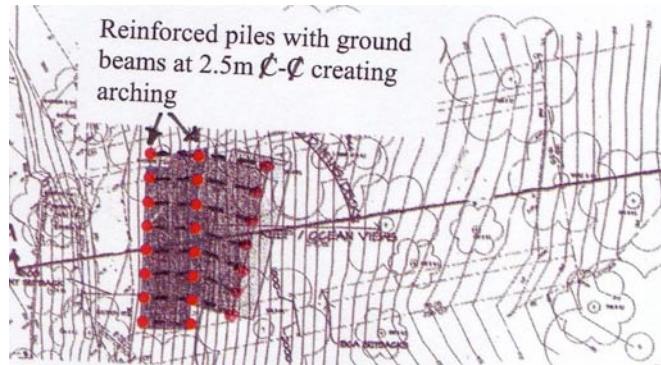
Pier Reinforcement – Moreley Avenue, Wye River
